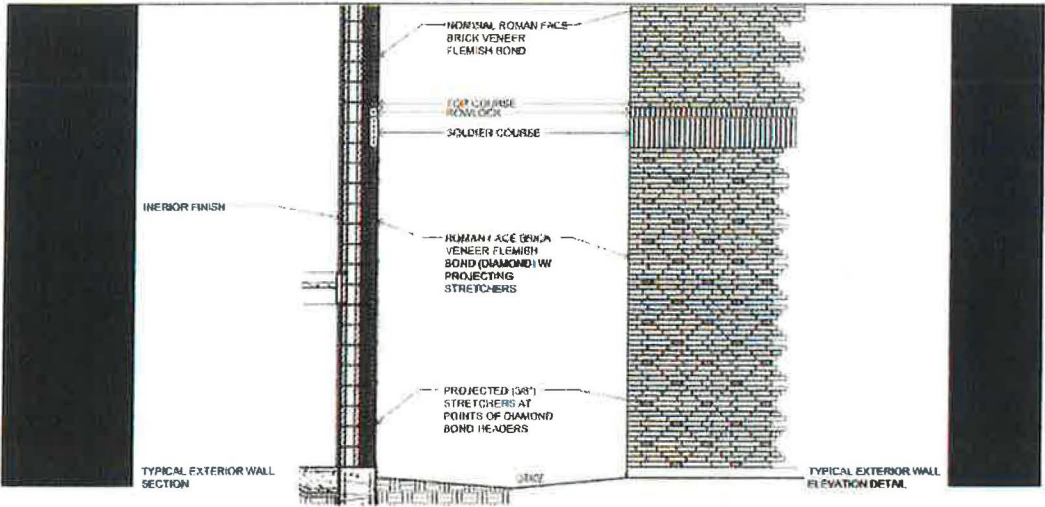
FAÇADE SECTION & FAÇADE DETAIL ELEVATION
